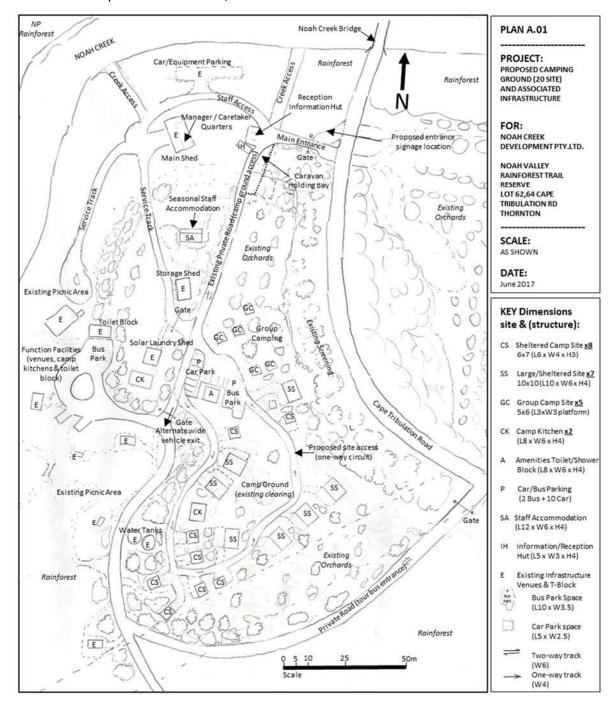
Layout plan No1. Showing the proposed Camp Ground Sites and Infrastructure
